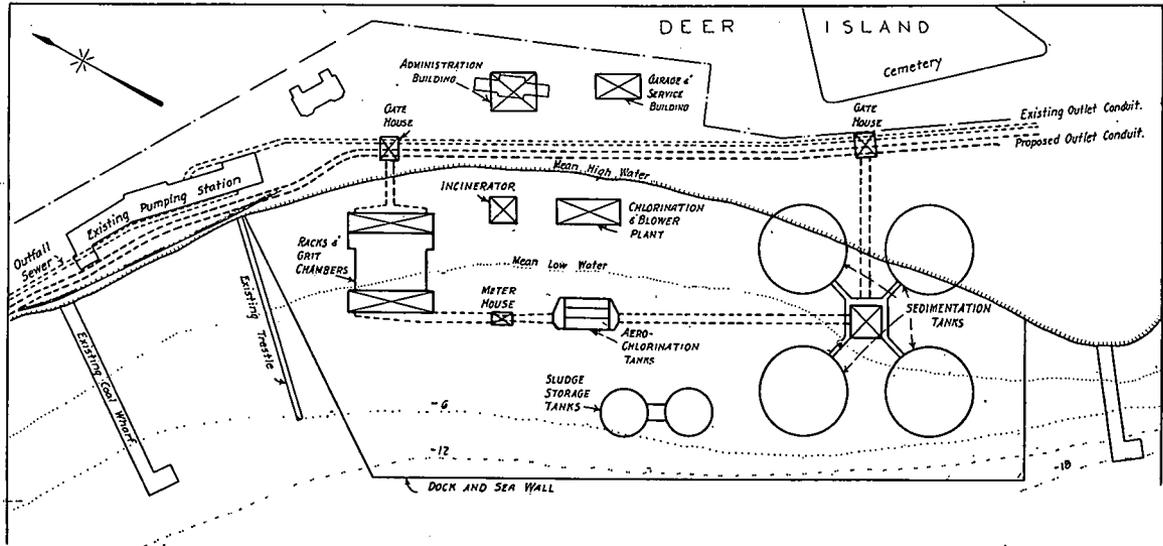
PRELIMINARY LAYOUT OF SEWAGE TREATMENT PLANT AT DEER ISLAND
